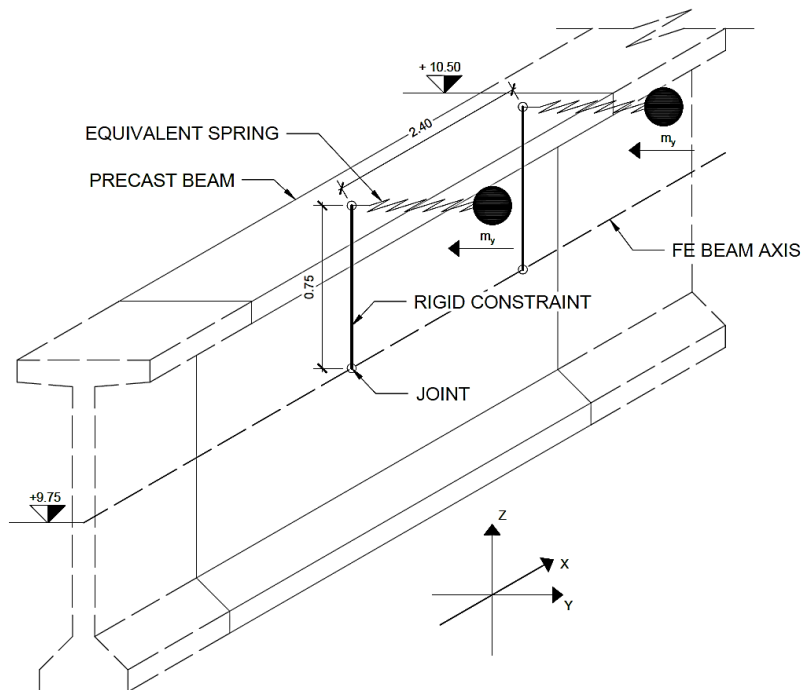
Modelling of cladding panel in the X direction (units in m).
